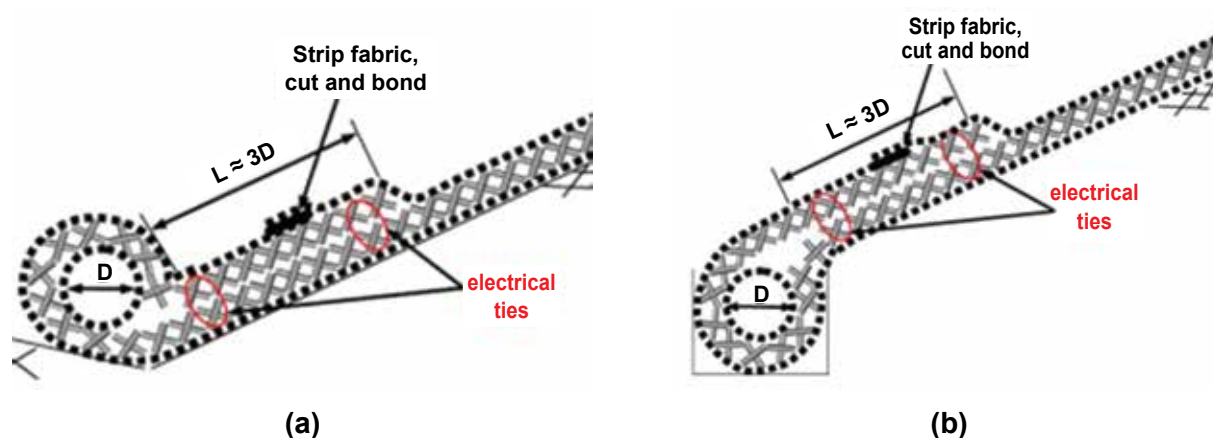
(a) Drainage Pipe on a Slope, (b) Drainage Pipe in a Trench
